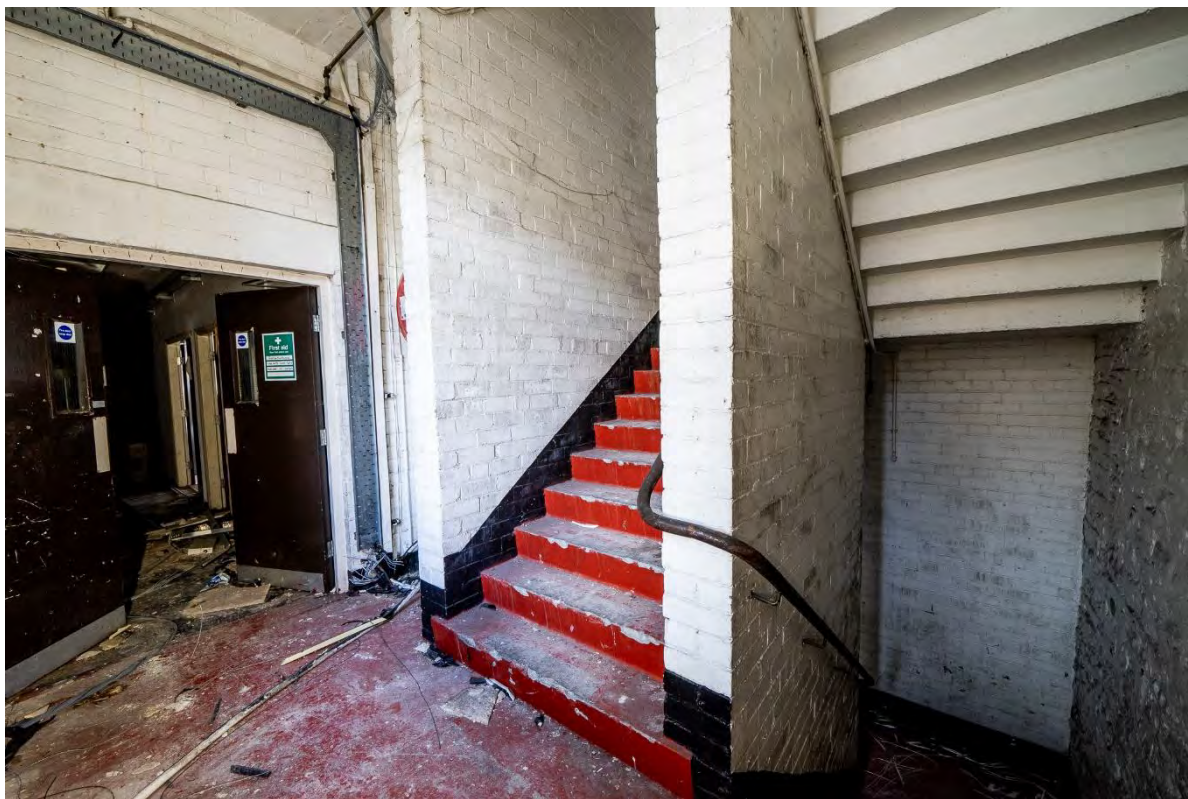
Main stair within the western end of the south range, facing south (first floor)
